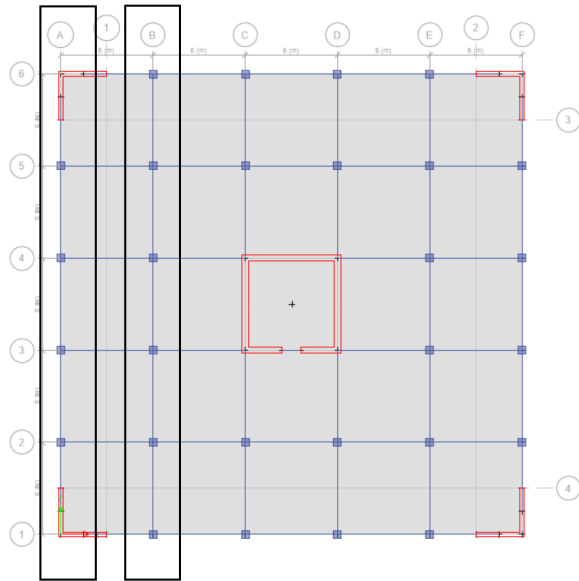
Plan View of the Building highlighting BB and AA planes
